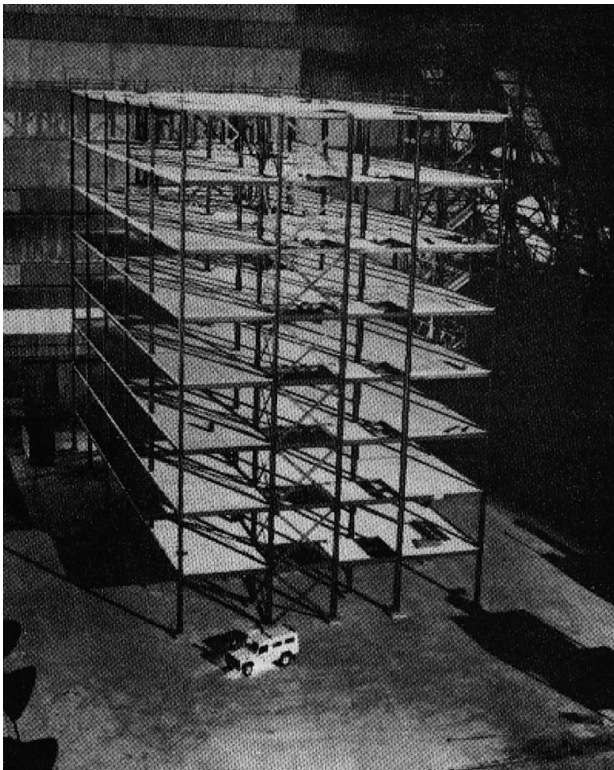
The Cardington fire test building structure. © Building Research Establishment.
